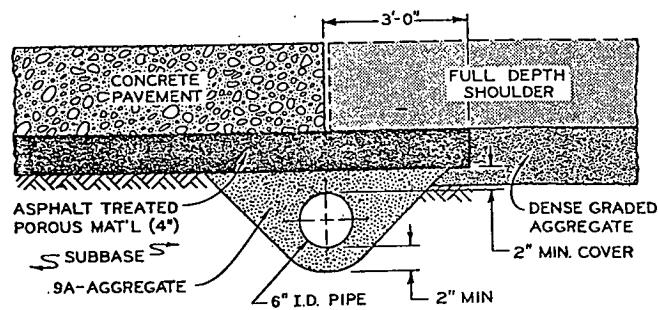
Cross section of asphalt-treated porous material (ATPM) drain installation (Michigan) (55).
